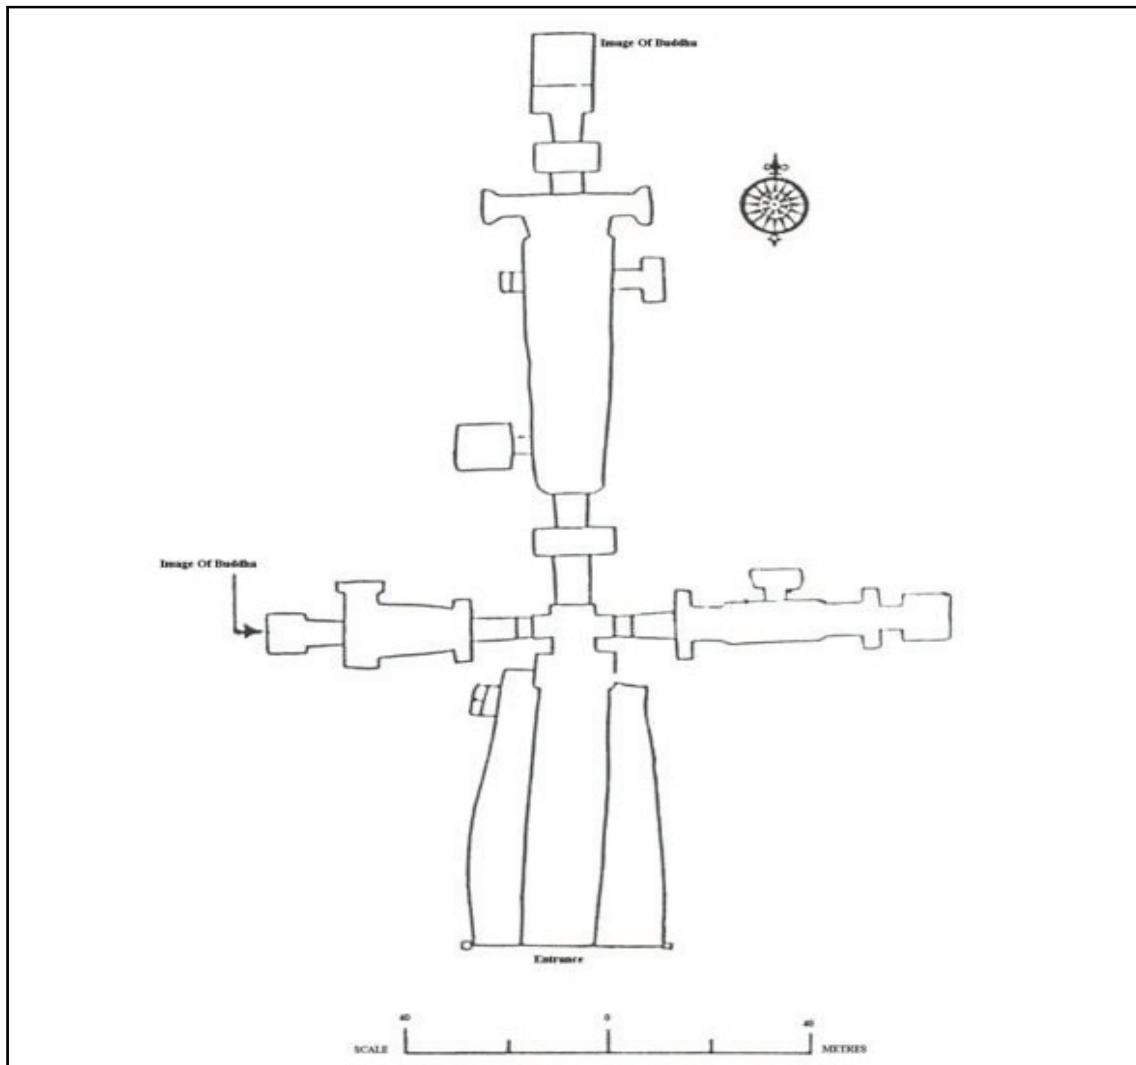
Vijayasen Cave, Bhadravati, Chandrapur
